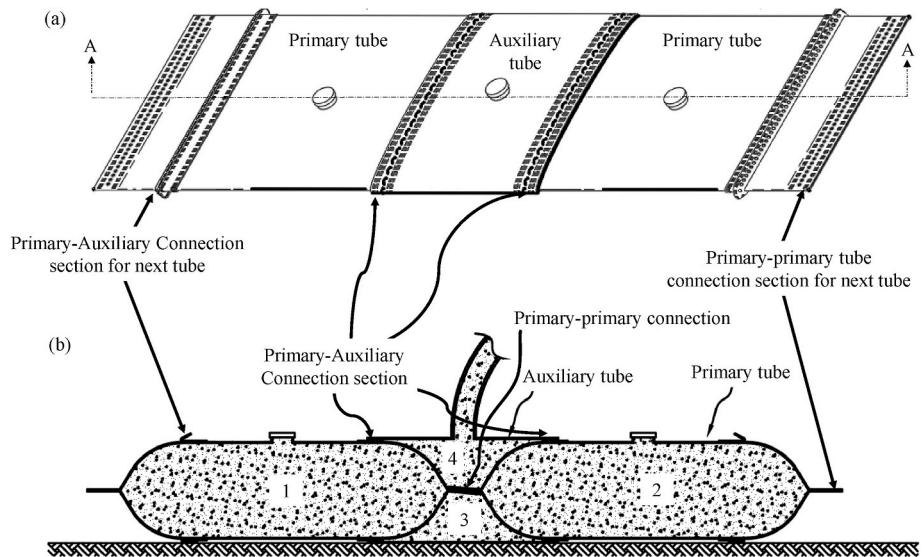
a) Proposed novel connection assembly plan, b) sectional elevation AA and filling sequence.
